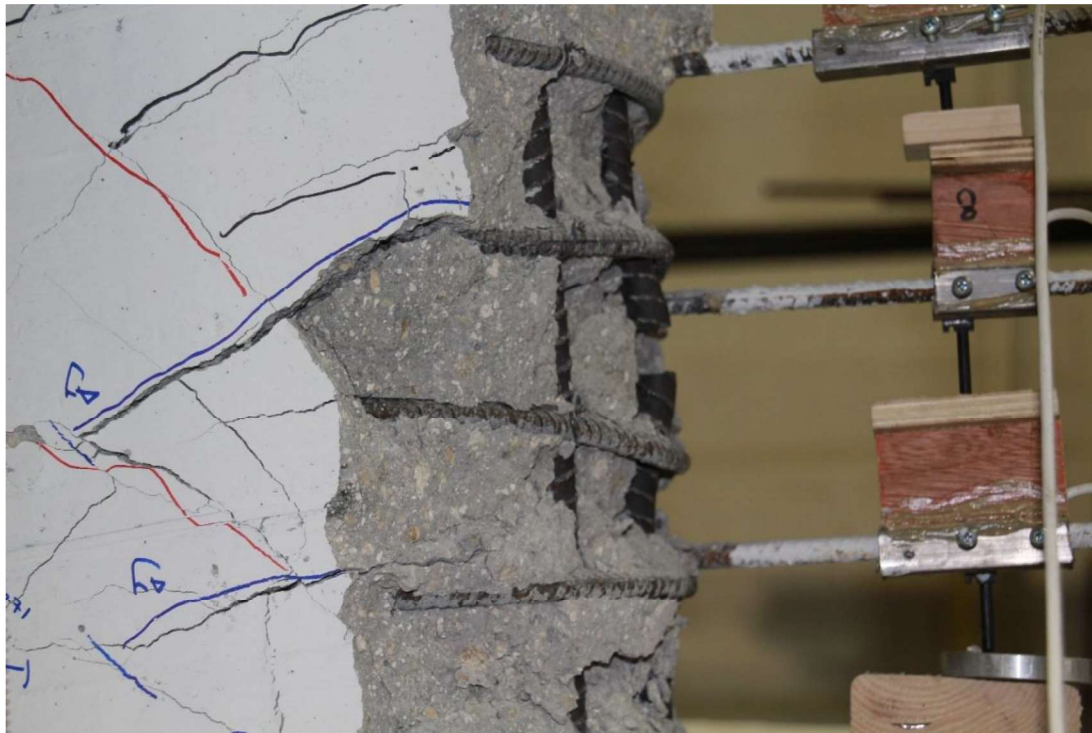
Fracture in the column longitudinal bar at first cycle of  $7\Delta_y$  (south).
